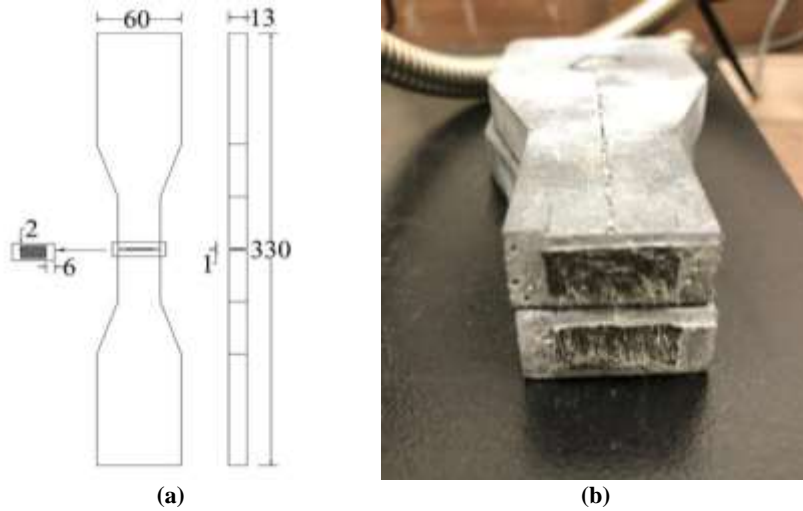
(a) dumbbell sample dimensions with notch (Adapted from (16)), and (b) dumbbell specimen at test completion
